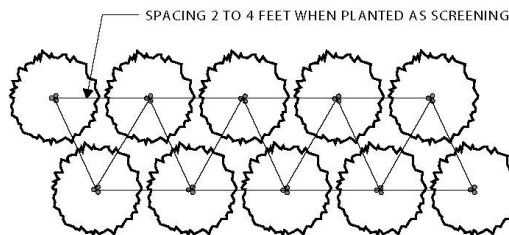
A.3.B: SHRUB PLANTING
